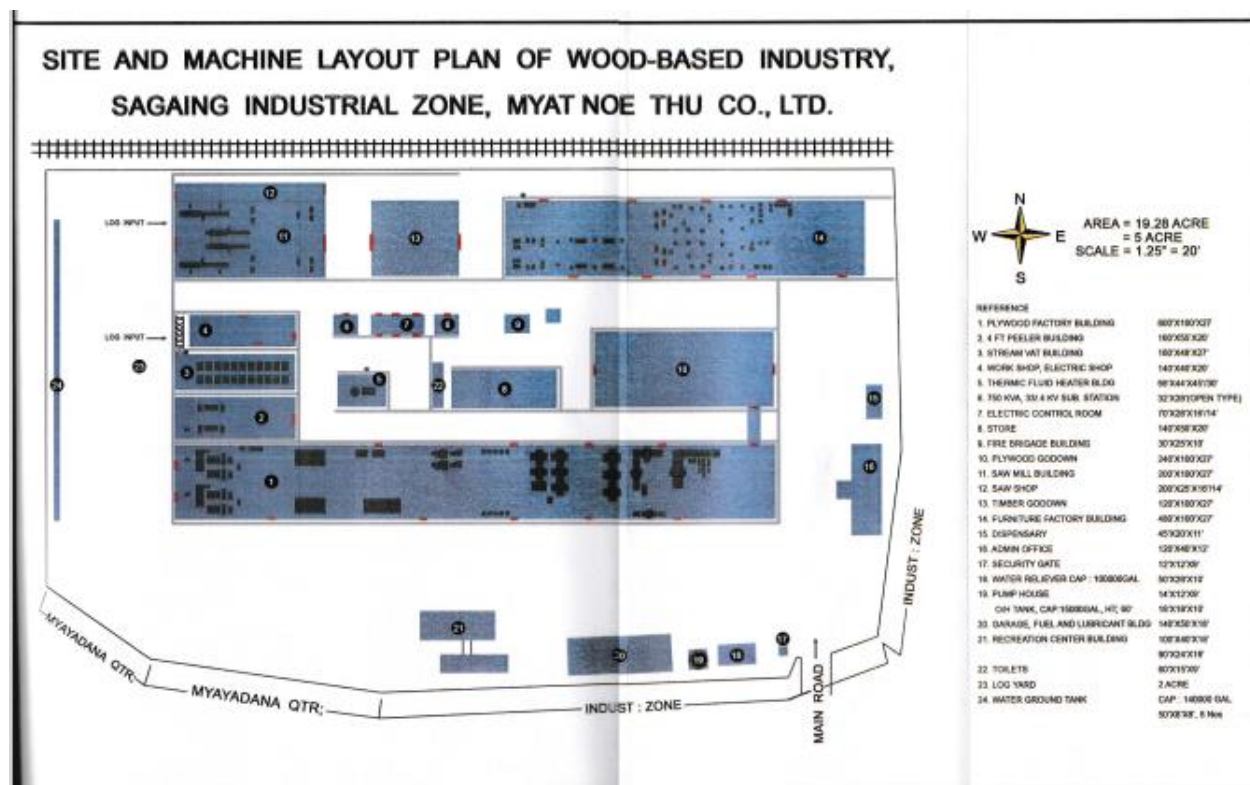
Layout plan of Myat Noe Thu Wood-based Factory
